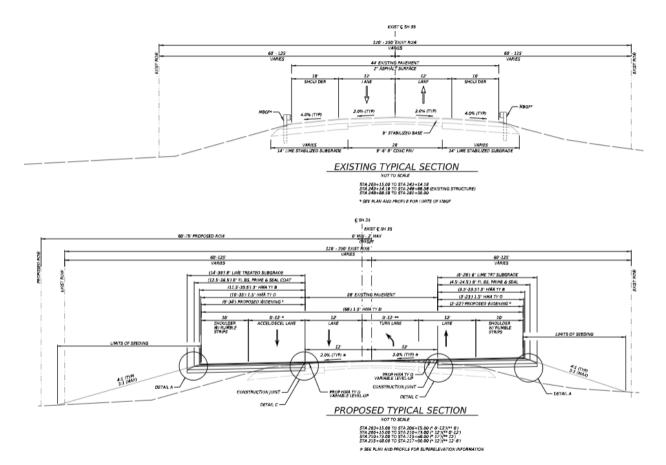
| 30% Designs Showing Existing and Proposed Cross Sections
